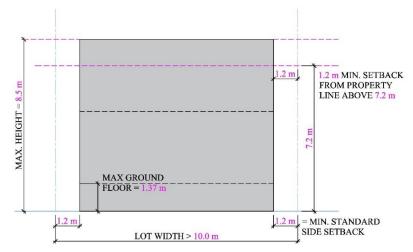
K.F4: Flat Roof Building with Side Yard Setback of 1.2 Metres
